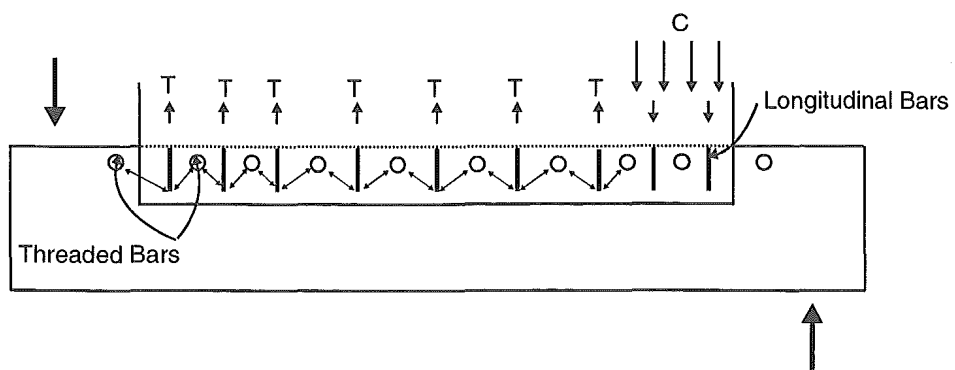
Wall panel-foundation beam internal force-flow in the longitudinal direction.
